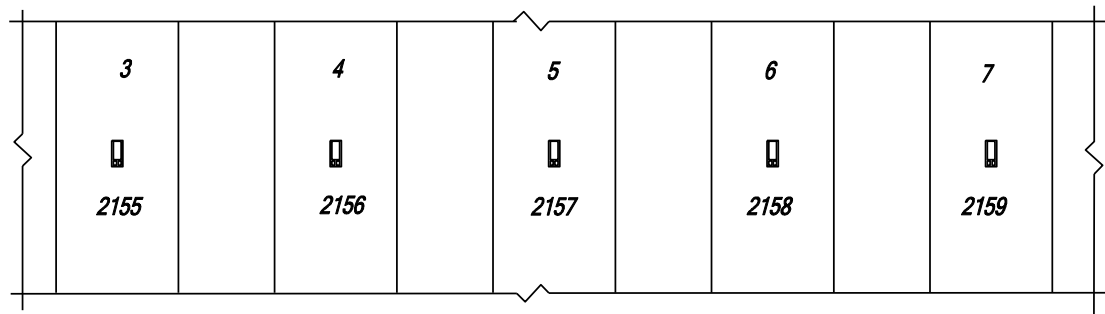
Locations of LVDTs at section Y-Y in Figure 73 (drawn by Alapati)
